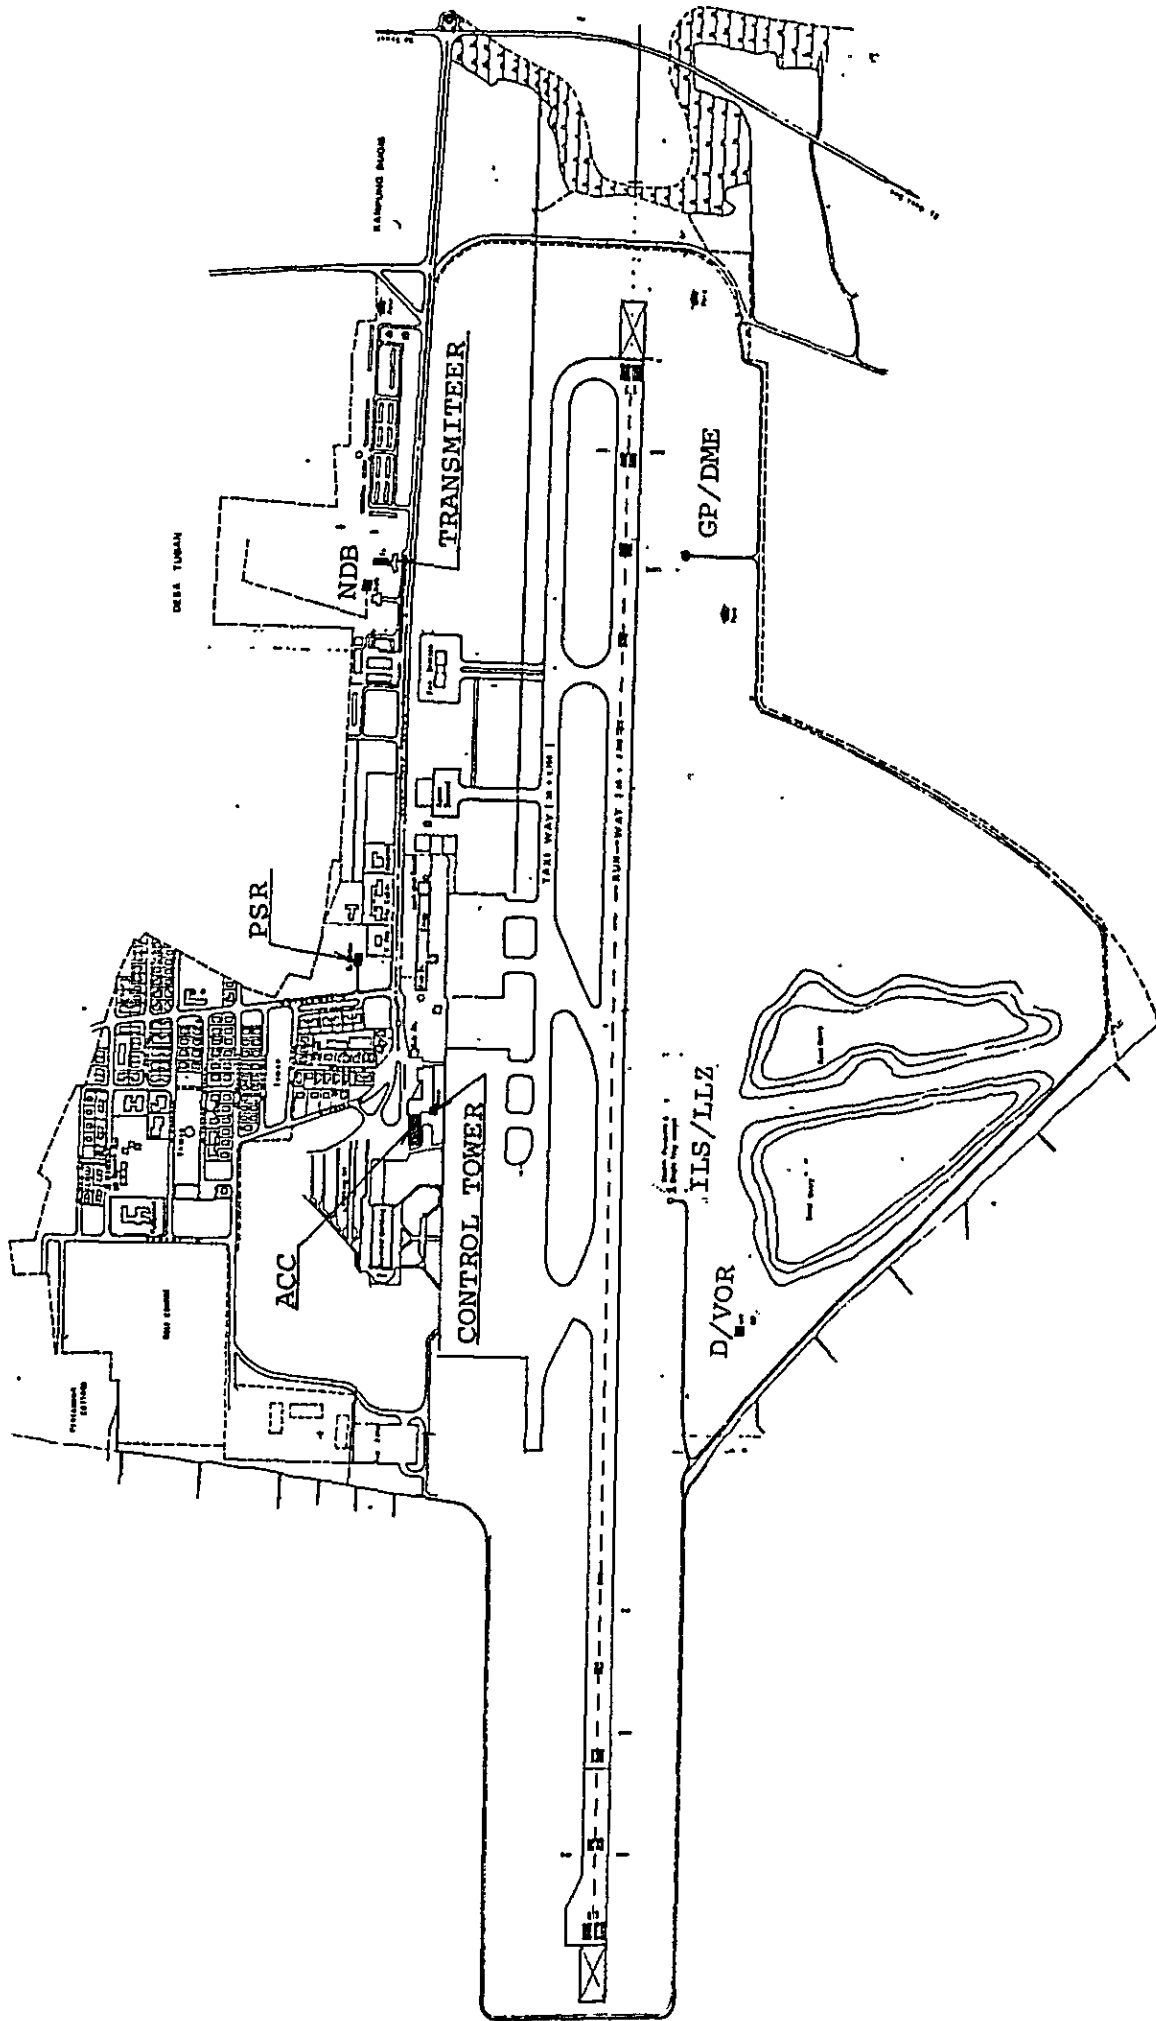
LAYOUT PLAN OF EXISTING NAVIGATIONAL AIDS
